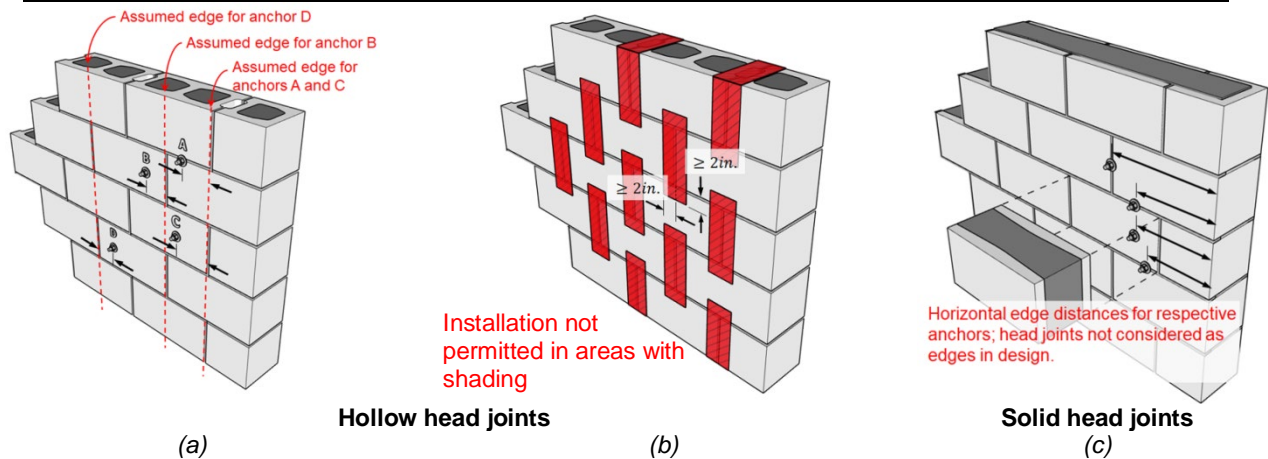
(a) Edge distance considerations in fully grouted CMU construction with hollow head joints, (b) exclusion zones in fully grouted construction with hollow head joints, and (c) edge distance considerations in fully grouted CMU construction with solid head joints. Note: dimensions to upper and lower edges omitted for clarity.
